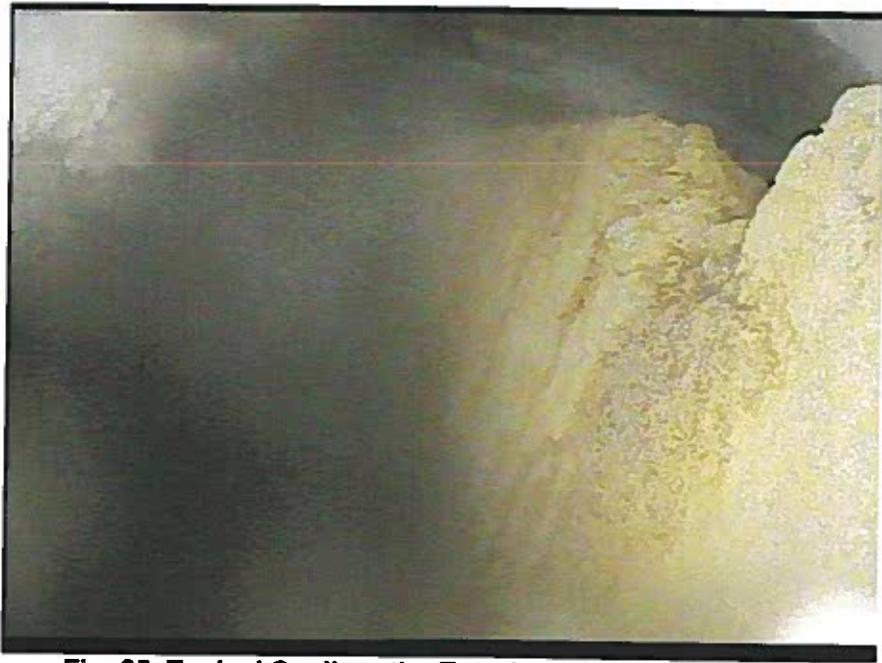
Typical Spall on the Exterior Face of the Parapet
